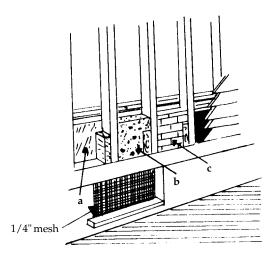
Method of excluding rats from double walls. In old buildings, galvanized sheet metal (a) may be cut to fit and nailed into place between studs, joists, floor, and sill; in buildings under construction, noncombustible stops of good quality concrete (b) or bricks (c) are recommended.
